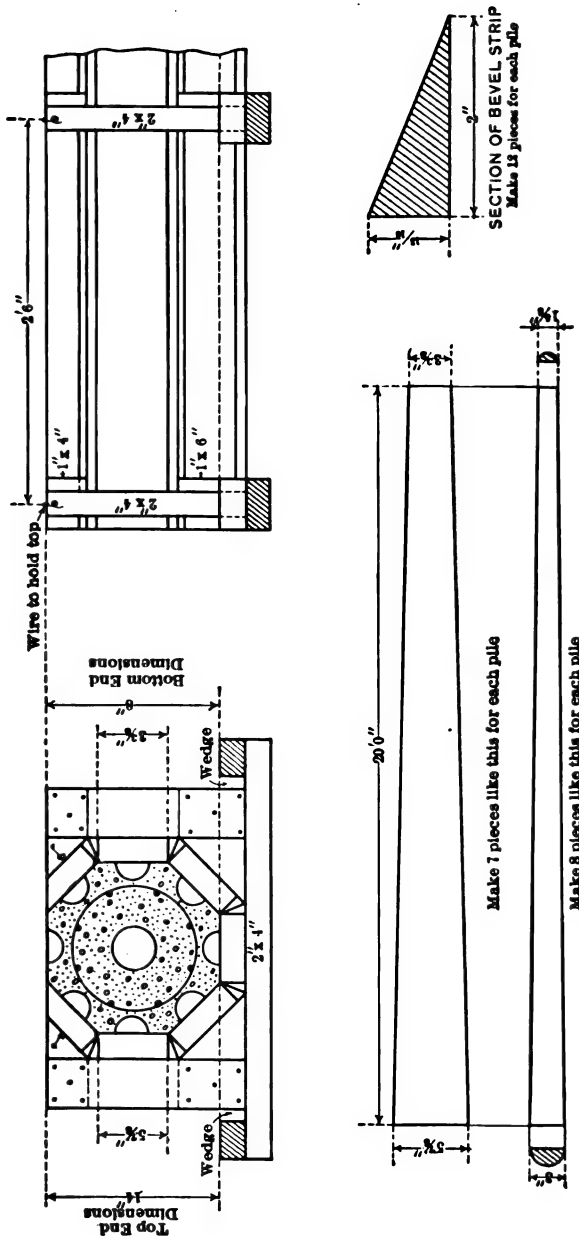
CORRUGATED CONCRETE PILE FORMS.
